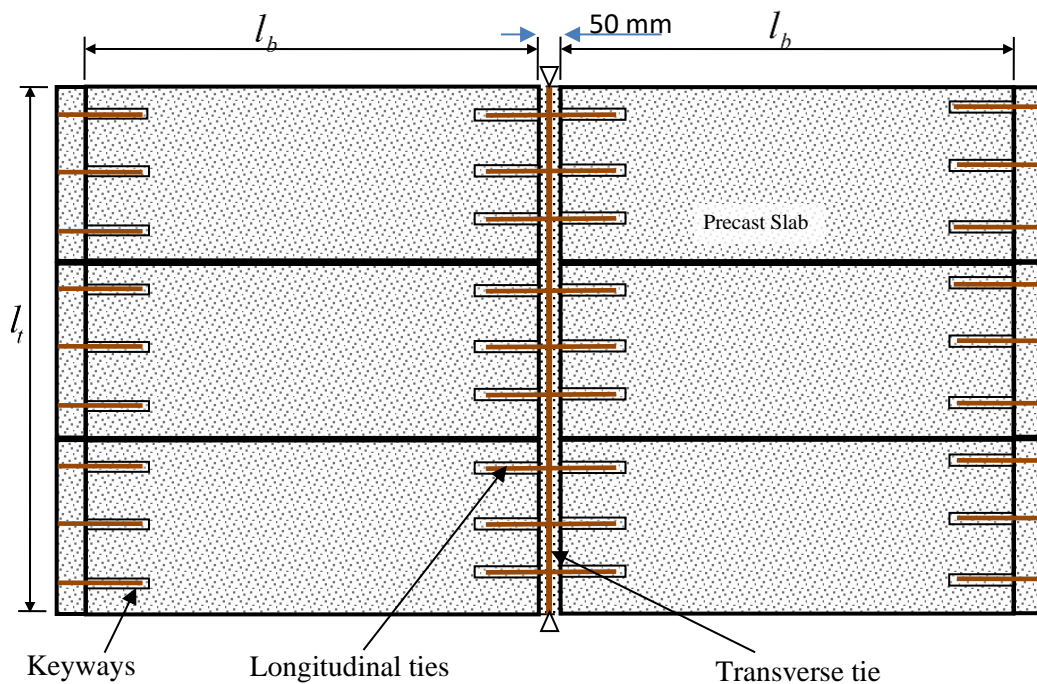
Floor-to-floor system facilitated by longitudinal and transverse ties
